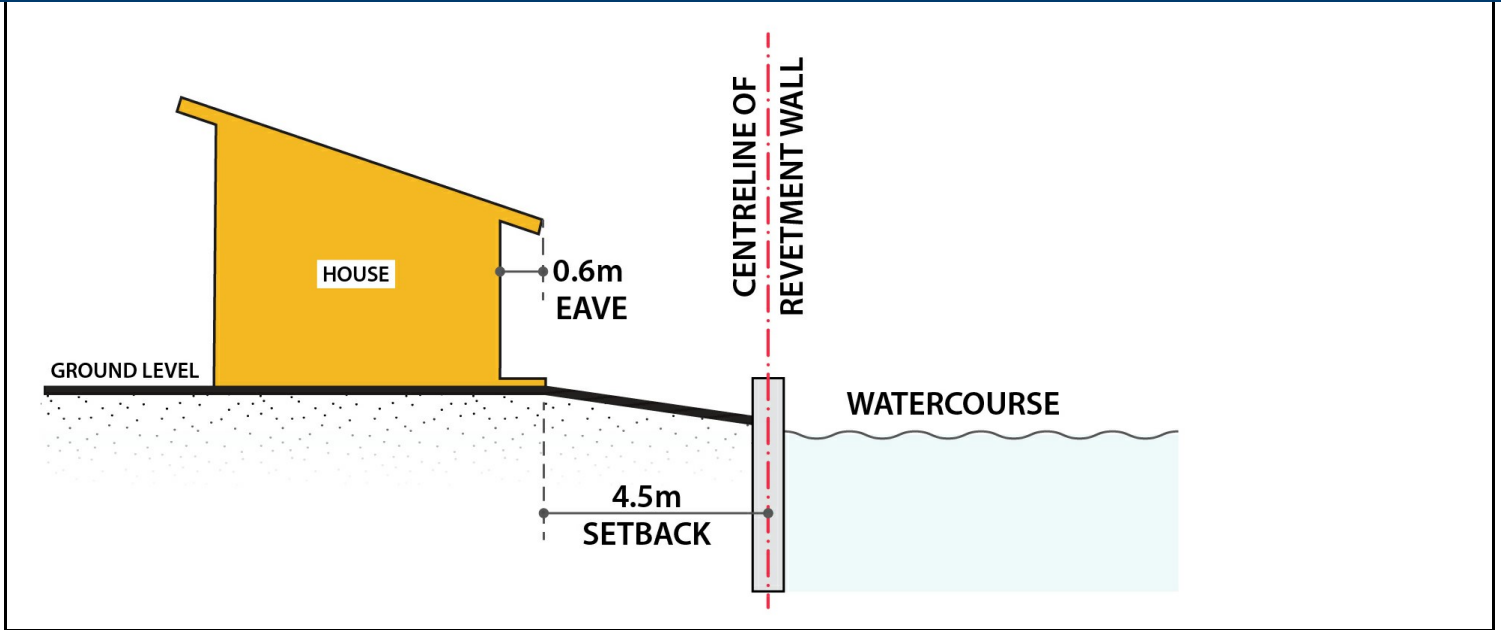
Noosa Waters Setbacks from Revetment wall
